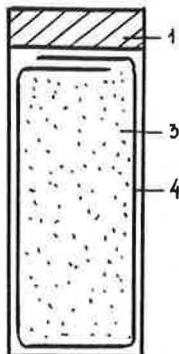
Slope drainage structure made of sand in the geotextile envelope:
